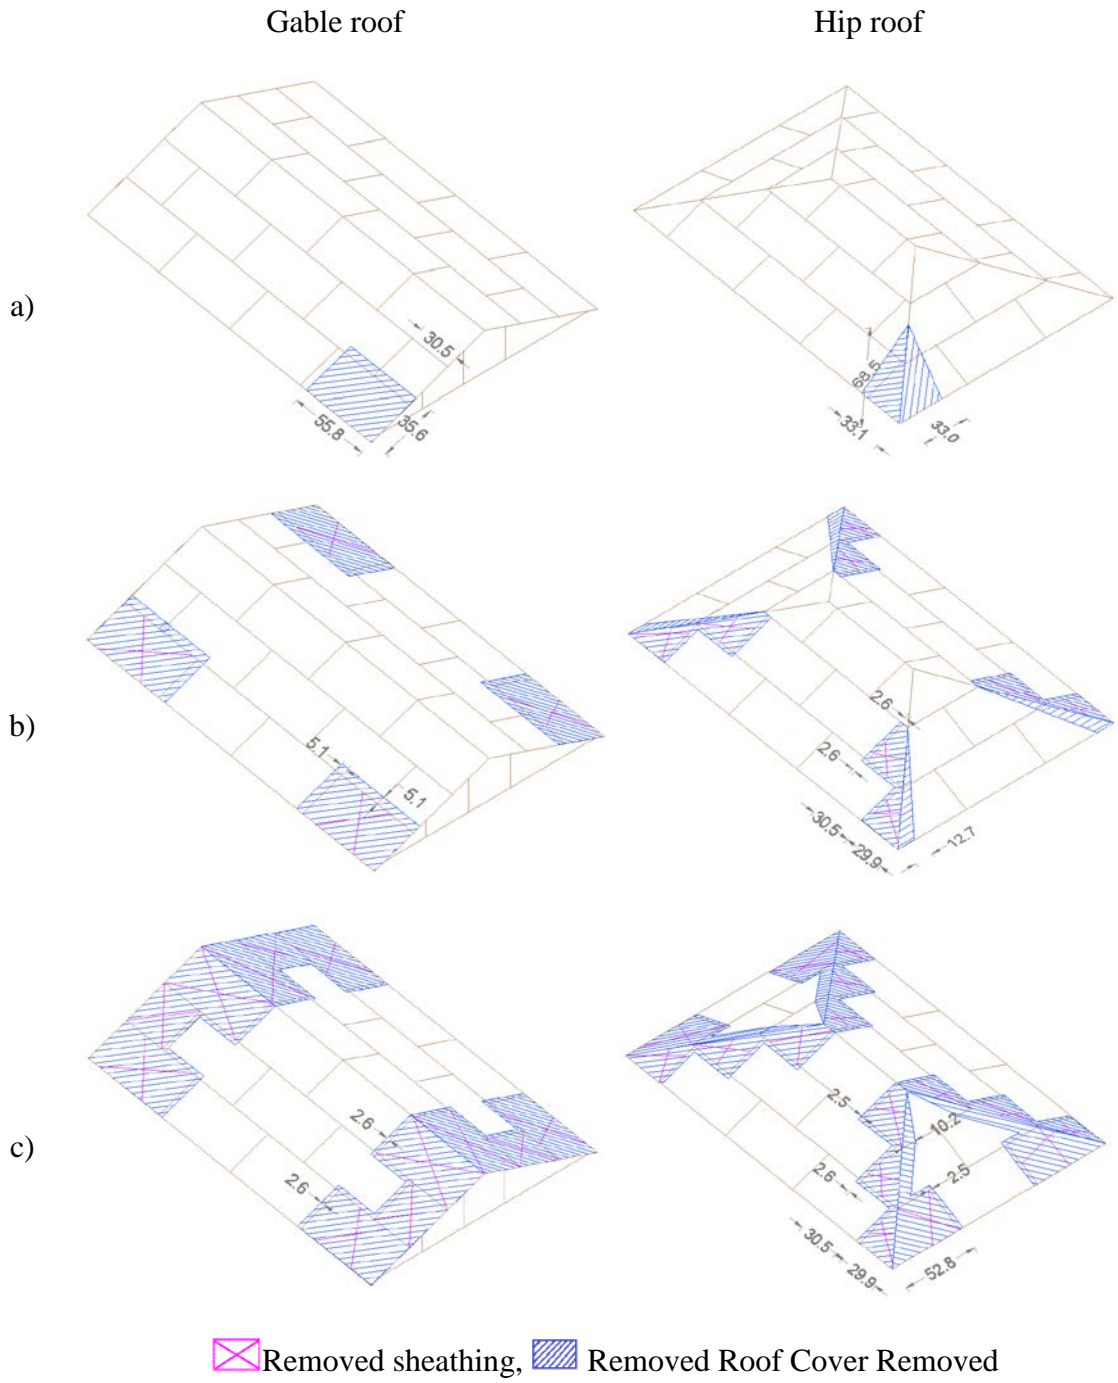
Gable and hip roof breaches at (a) light damage, (b) minor damage and (c) moderate damage states (scaled model dimensions in cm)
